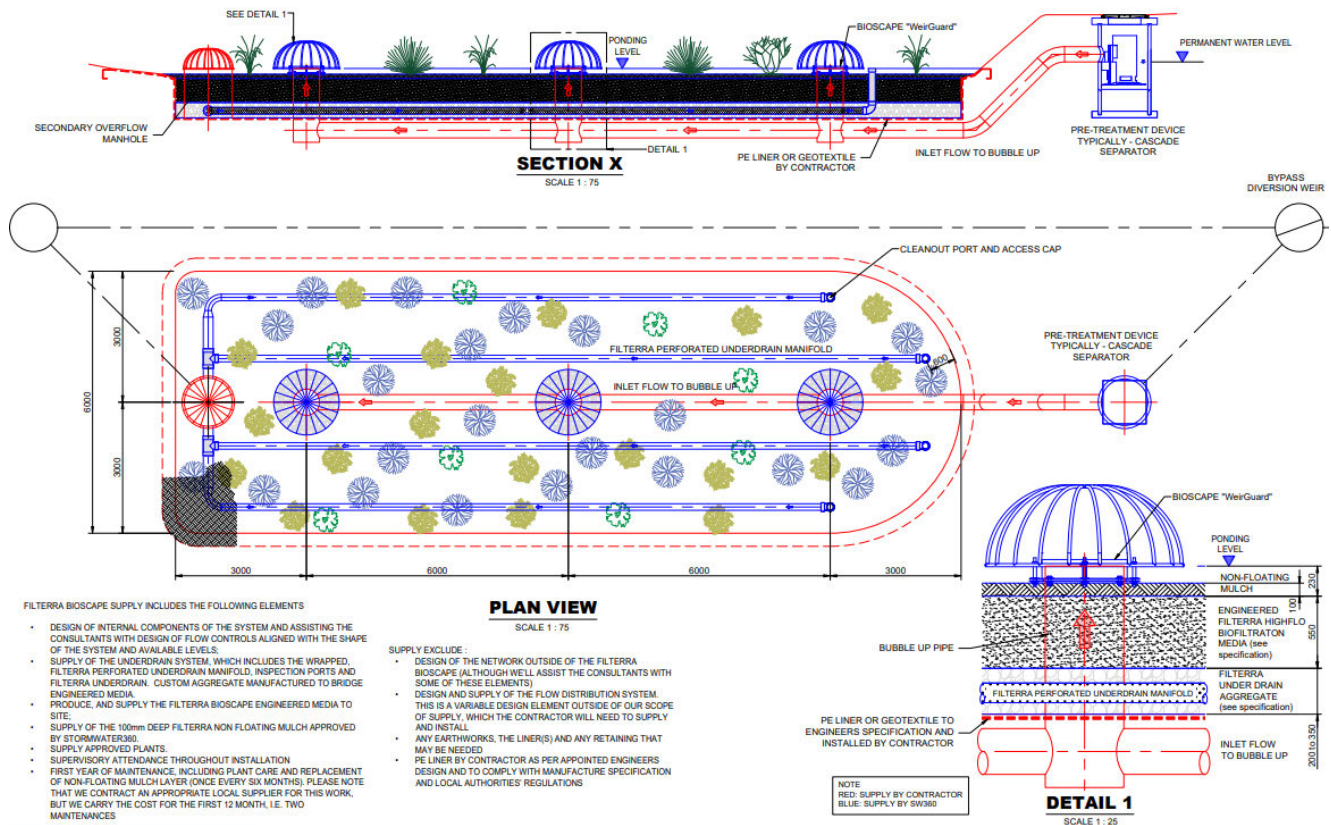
Stormwater360 Filterra Bioscape Typical Layout and Details.
